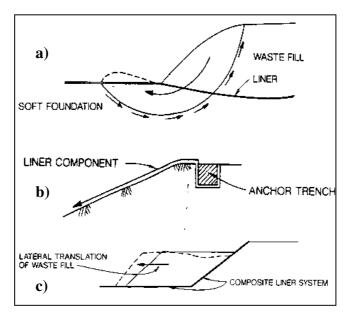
Potential failure mechanism according to soil foundation: a) failure of soft soil, b) translation of linear component, c) lateral translation of waste fill.
